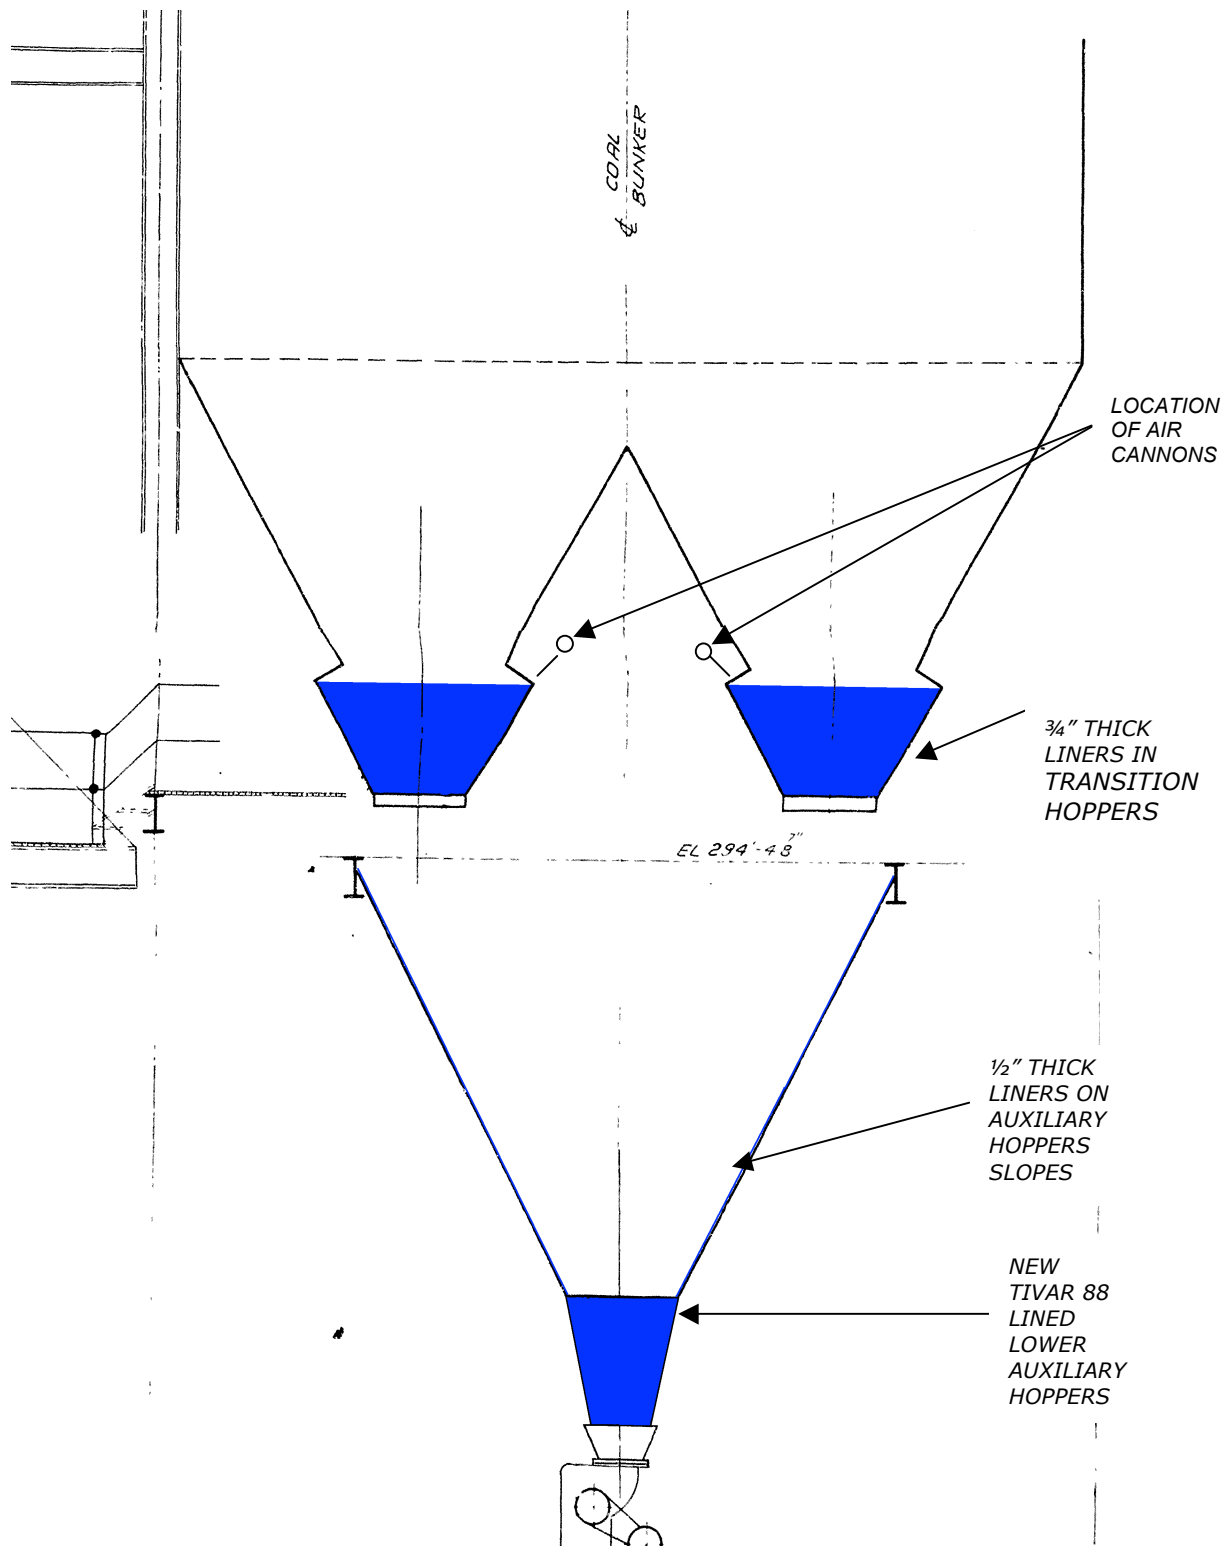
Arrangement of bunkers and hoppers showing location of air cannons and liners
